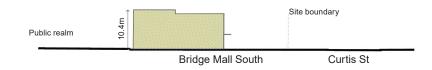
Built form test of street wall, setback and upper level heights- Section G
